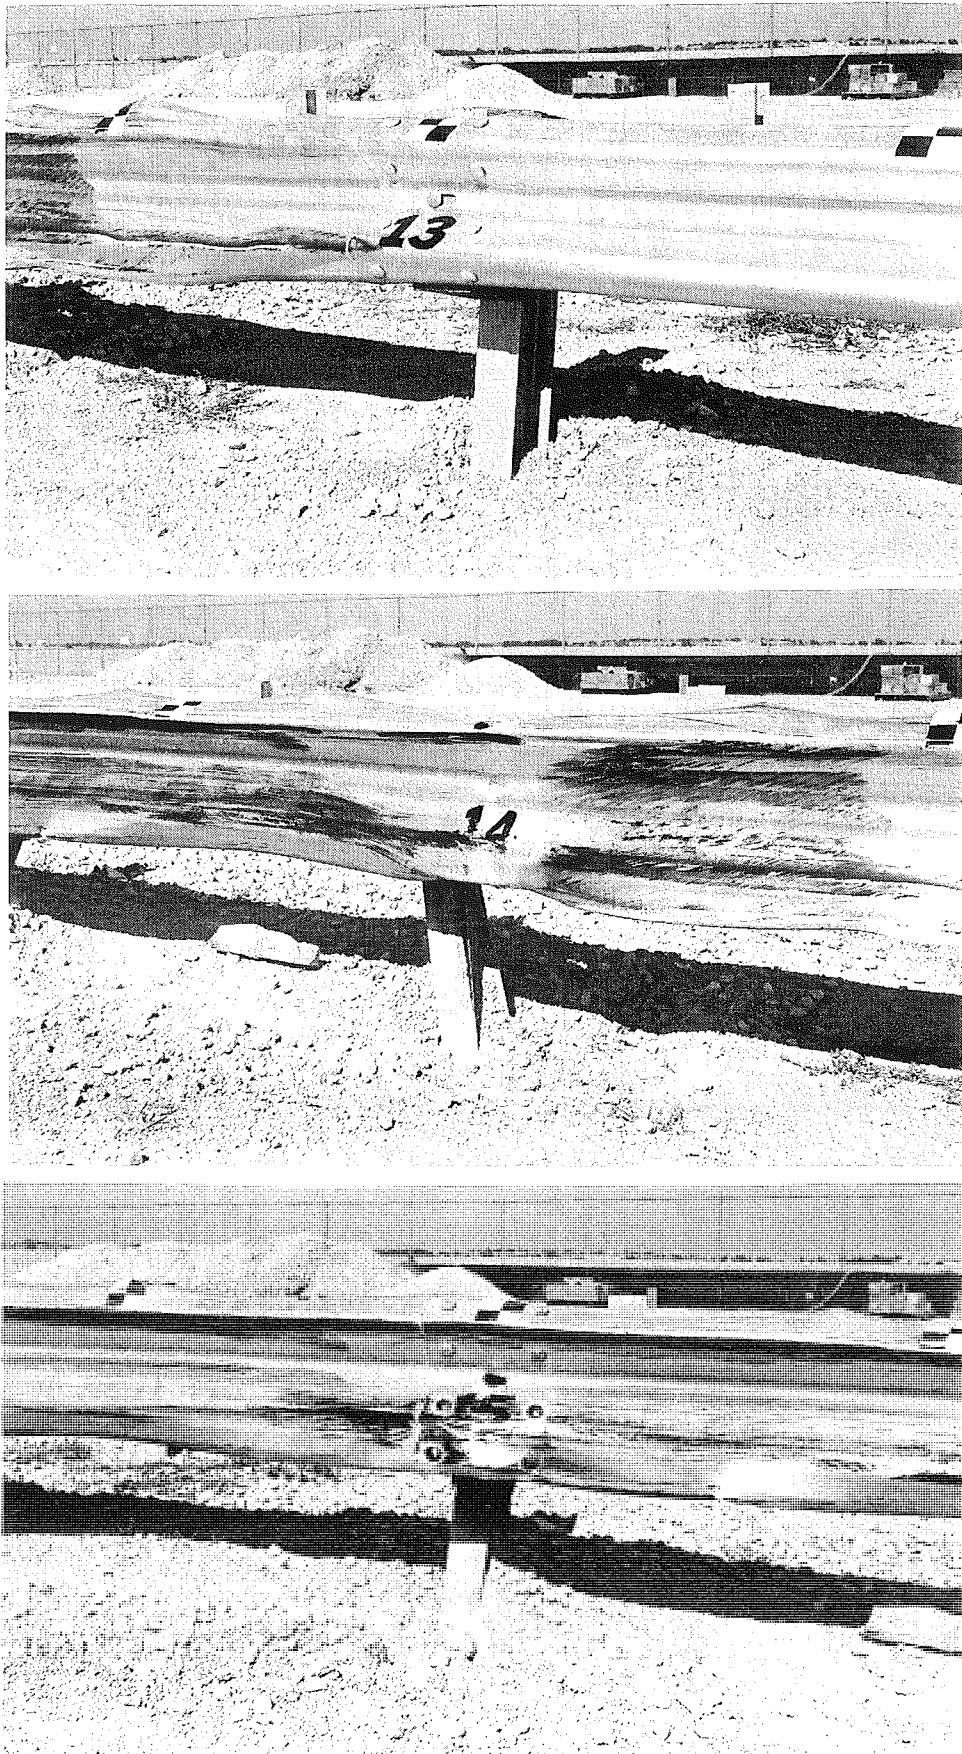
Type B Longitudinal Barrier Rail and Post Damage, Test MIW-1
